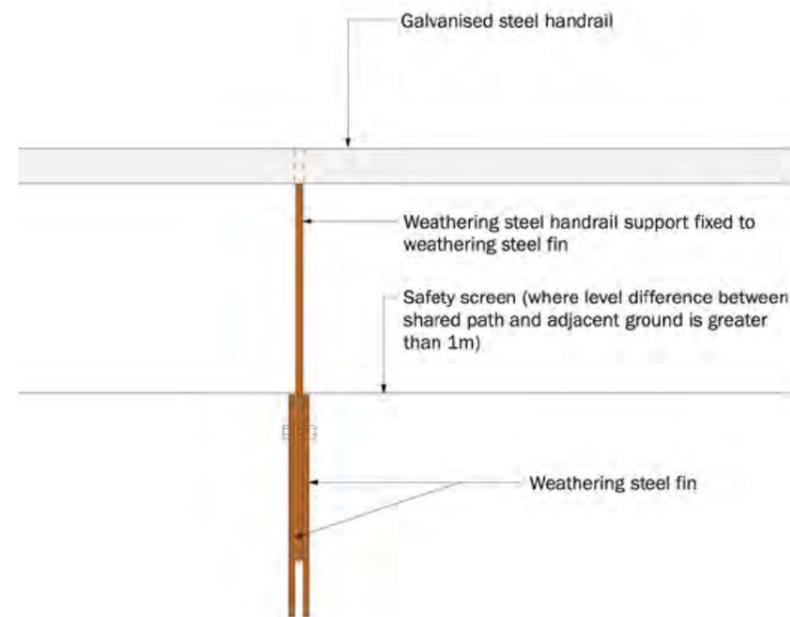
Bridge over Mount Ousley Road - Detail Section of throw screen and handrail support (Scale 1:50)
